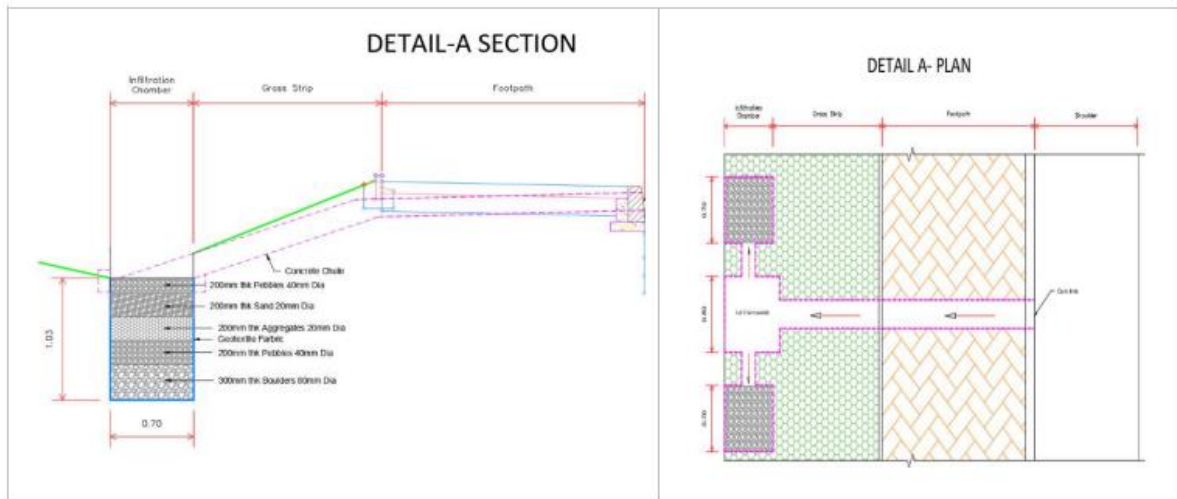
SUDS Details for Typical Cross section Type 1, 1A&1B SUDS
